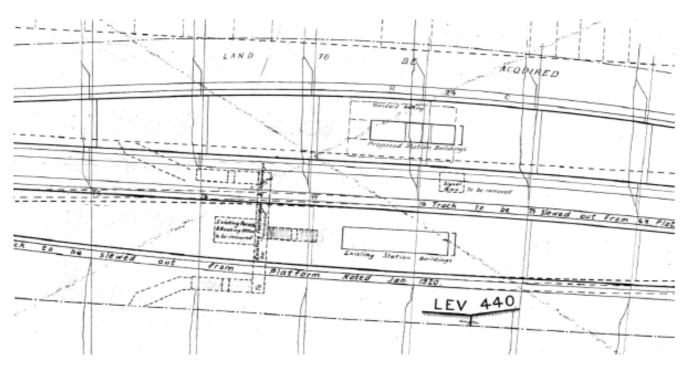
Banksia Station plan, 1917 (Source: Sydney Trains plan room)
